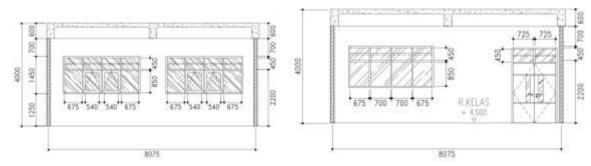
Second Floor Plan and Classroom Layout (Source by Author, 2024)
